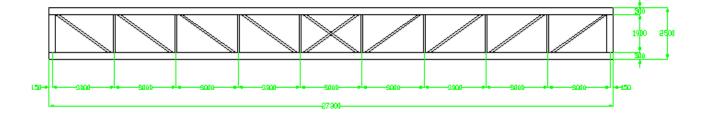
Truss used for girder, as shown in figure 10.18.
